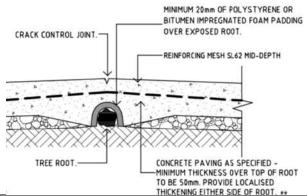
Image B: Example method for bridging concrete footpaths over tree roots provided in the Canterbury Bankstown Council standard drawings.⁹
